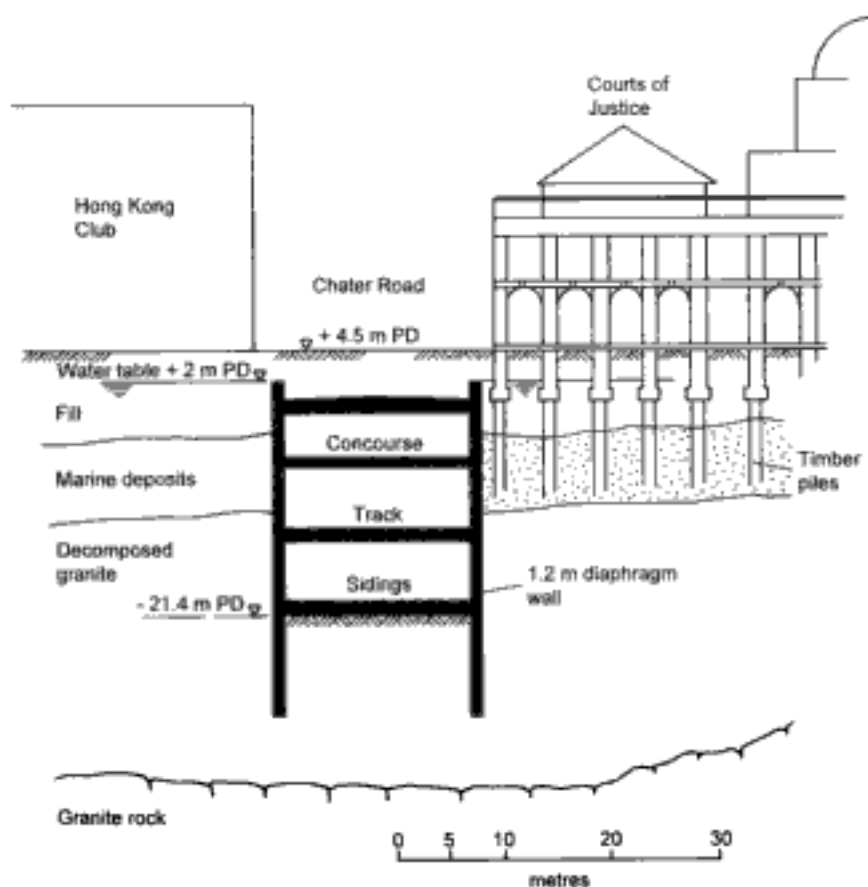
Cross-section of Chater station, Hong Kong, showing soil profile and location of existing structures (Davies and Henkel¹⁷)
